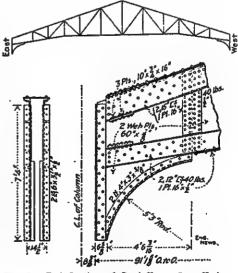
End Section of Roof Truss Over Train Waiting-Room.
